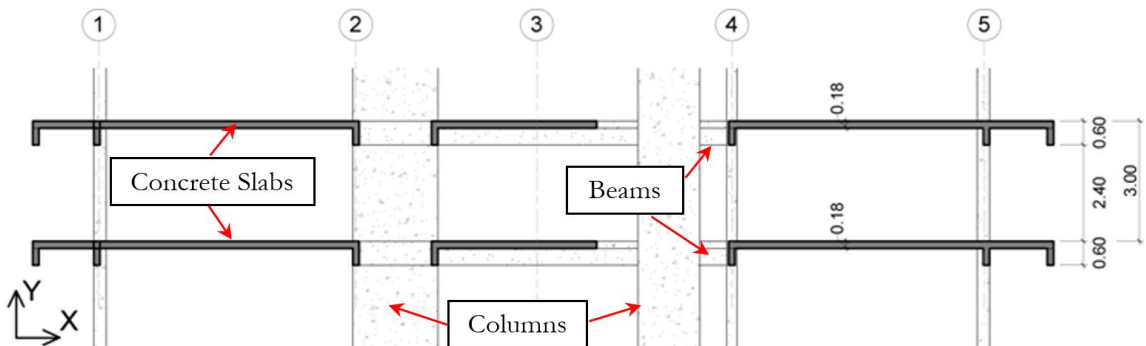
Detail of the concrete slabs thickness and height floor-to-floor.
